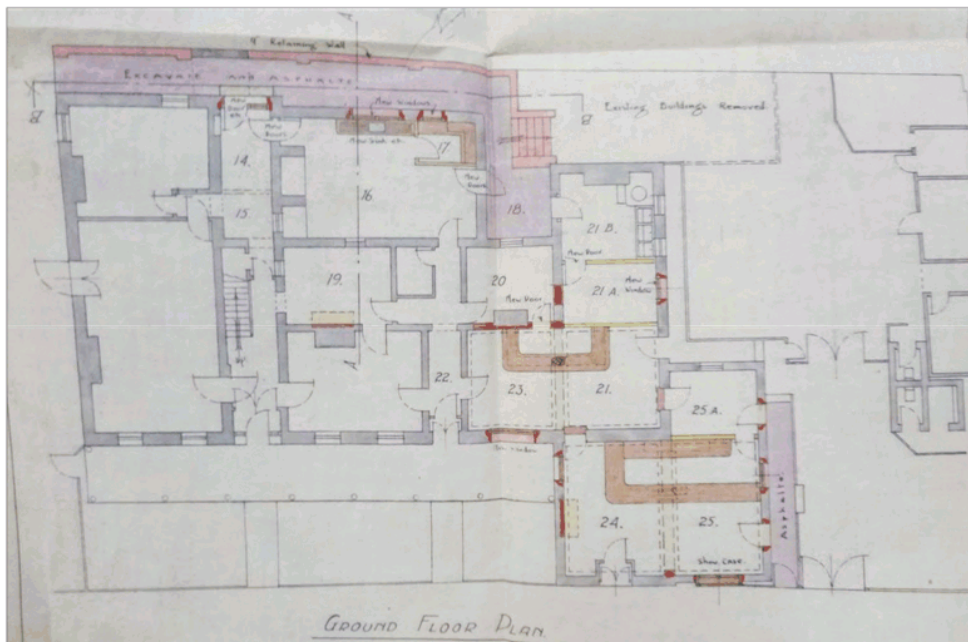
1926 plan showing modifications to ground floor of the Freemasons Hotel, north to right of the Figure (TAHO, AE417/1/1363, 58 Harrington Street (2828), 1926).
